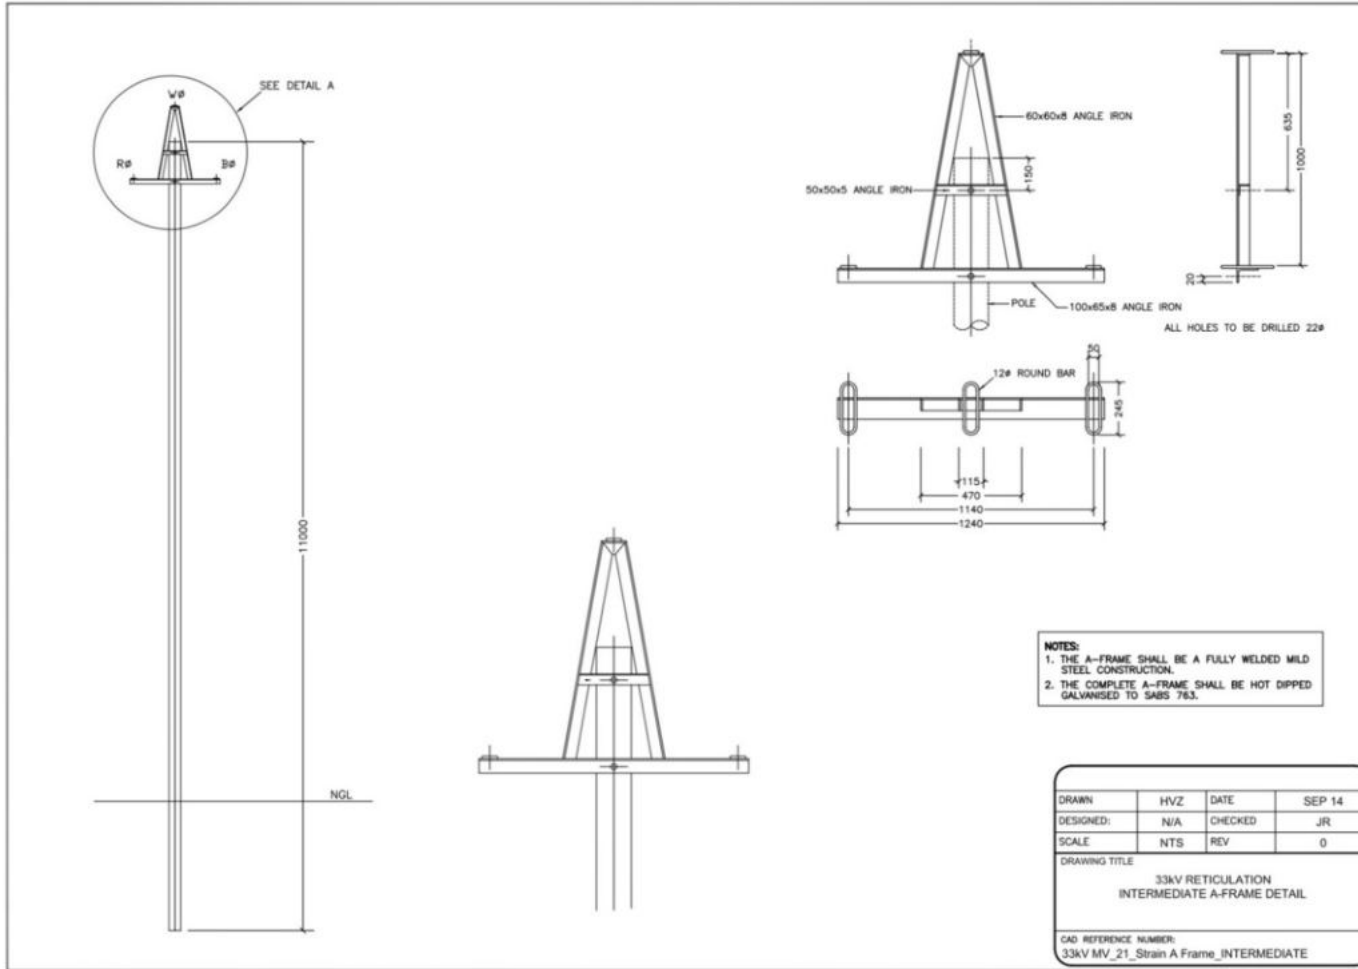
Details of proposed intermediate structures (alternative A-Frame Structures)
